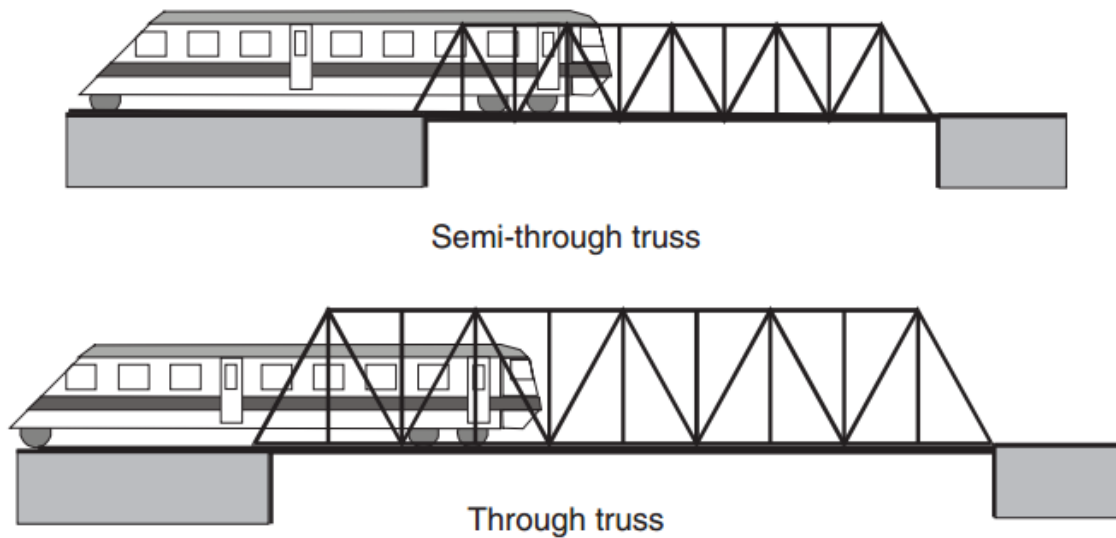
Illustration of Through and Semi-through bridge configurations [3]
